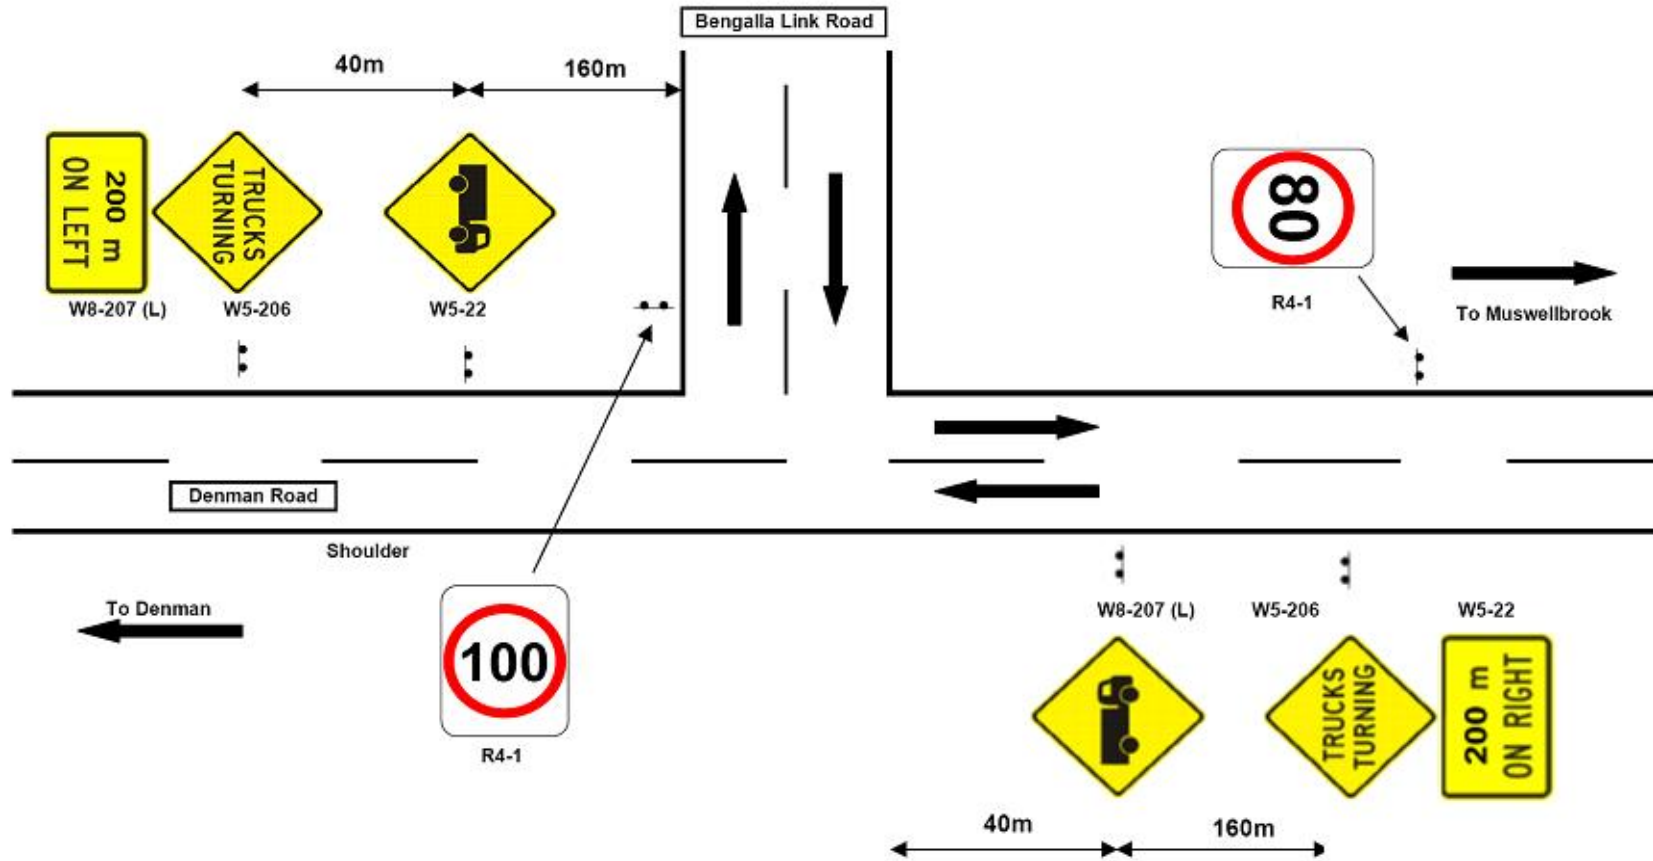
Traffic signs to be placed at the Bengalla Link Road/Denman Road intersection. Adopted from TCP195 (RTA, 2003)
